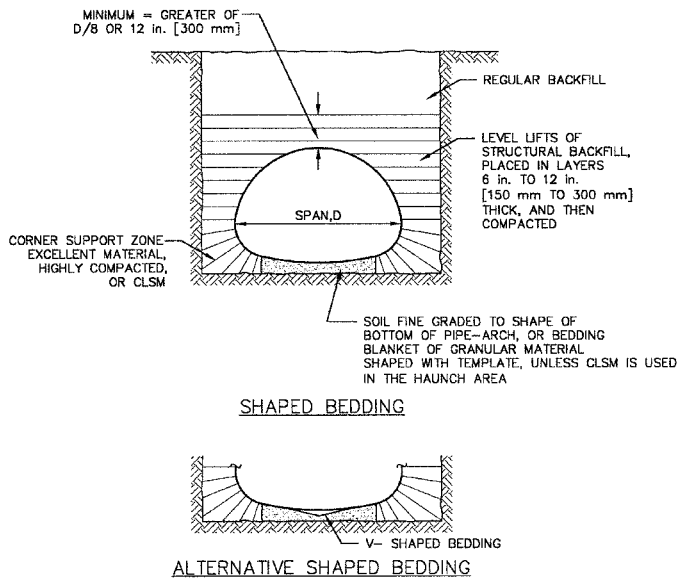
Bedding and Corner Zone Treatment for Pipe-Arch Structures
